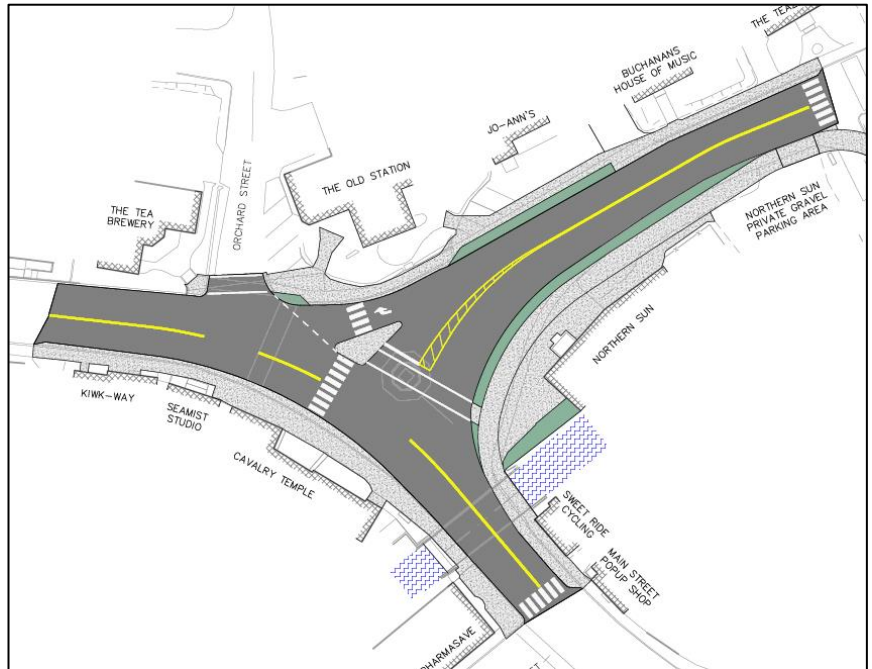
Concept Option 3 - Edgewater Street T-Intersection
